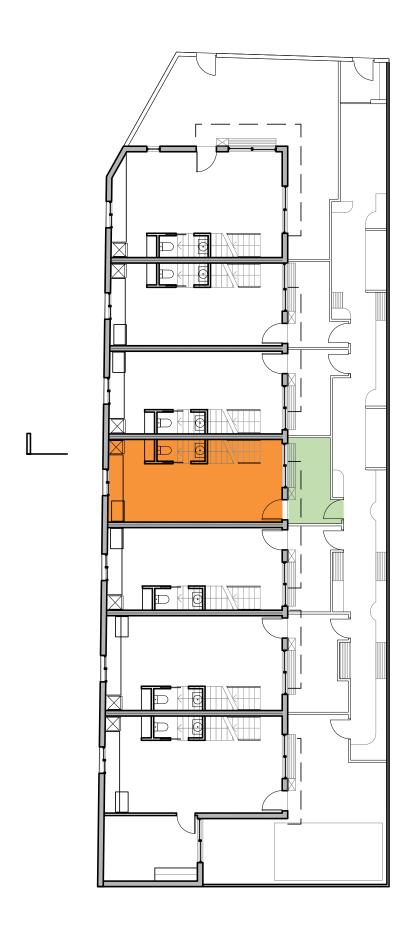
TOWNHOUSE GROUND FLOOR PLAN
